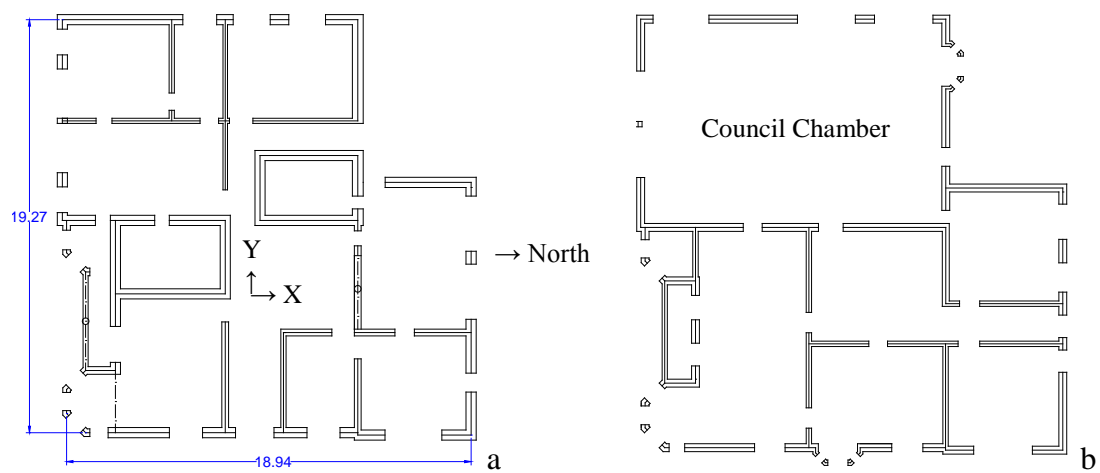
Structural plans of the (a) ground and (b) first storeys (original configuration).
